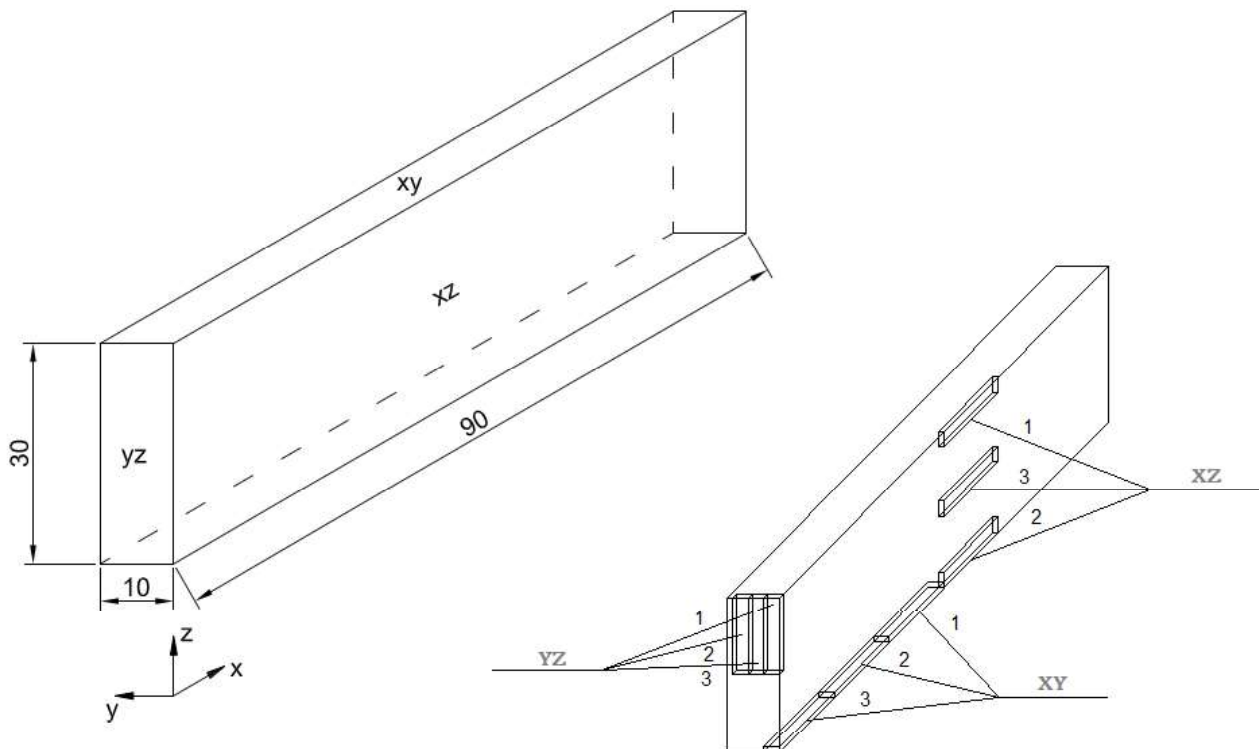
Concrete beam (30x10x90cm) with the cutting planes: XY, XZ, YZ.
